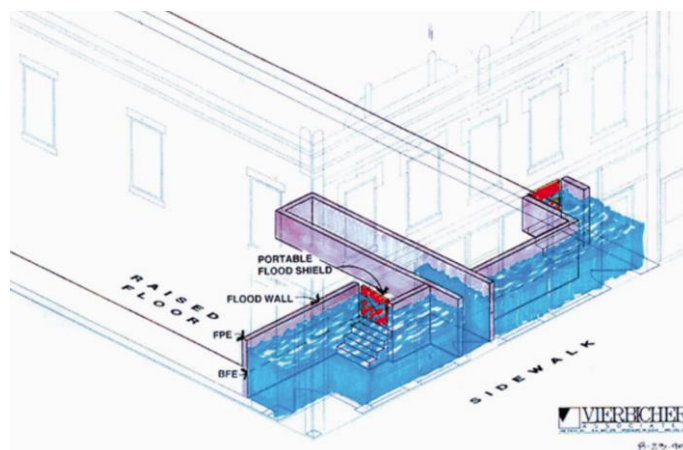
Dry Floodproofing (Source: FEMA 2008)
